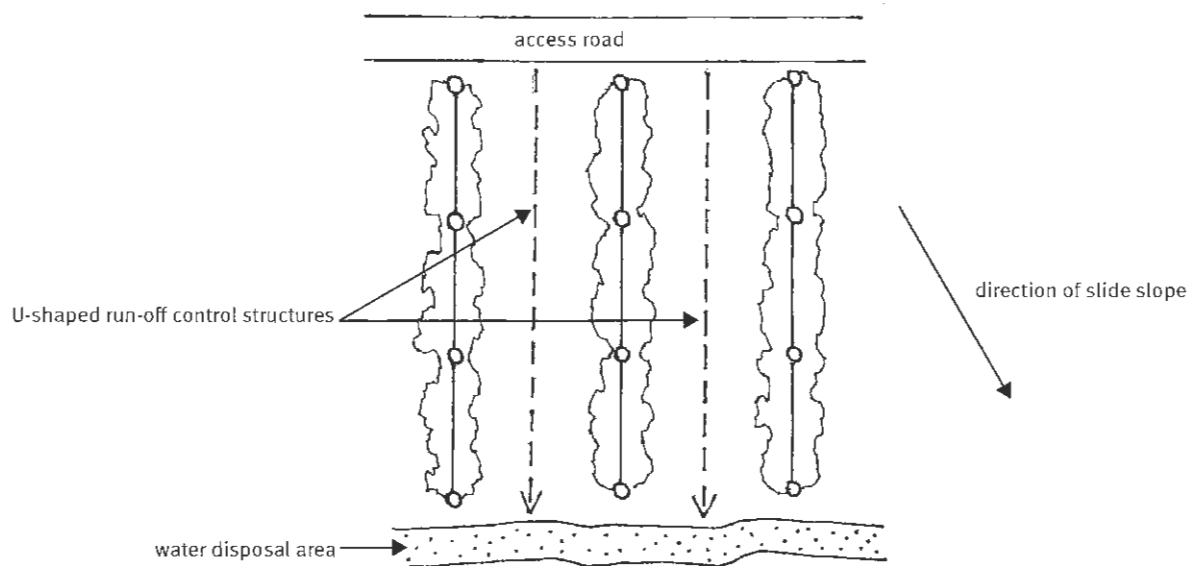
Down-slope rows with U-shaped run-off control structures
